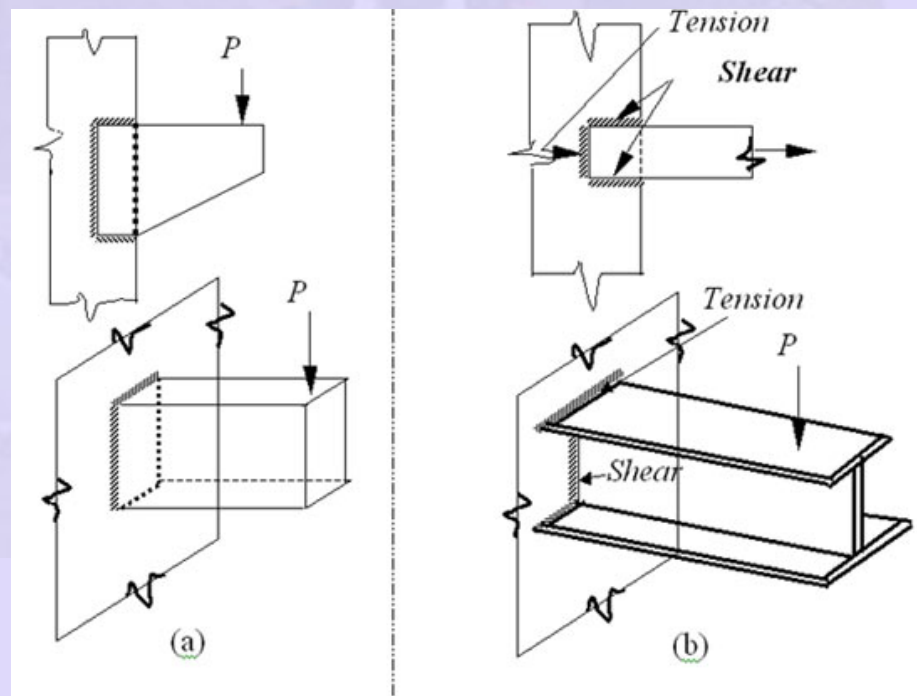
(a) connections with simple weld design, (b) connections with Direction- dependent weld design
